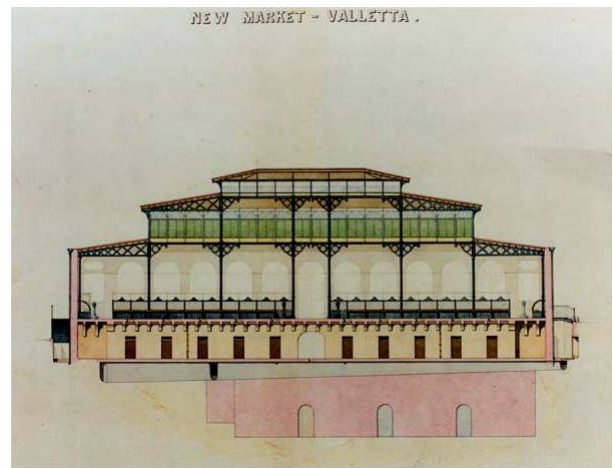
Longitudinal section showing roofing structure, cellar and cistern (© Records and Archives Section, Public Works, Malta).
